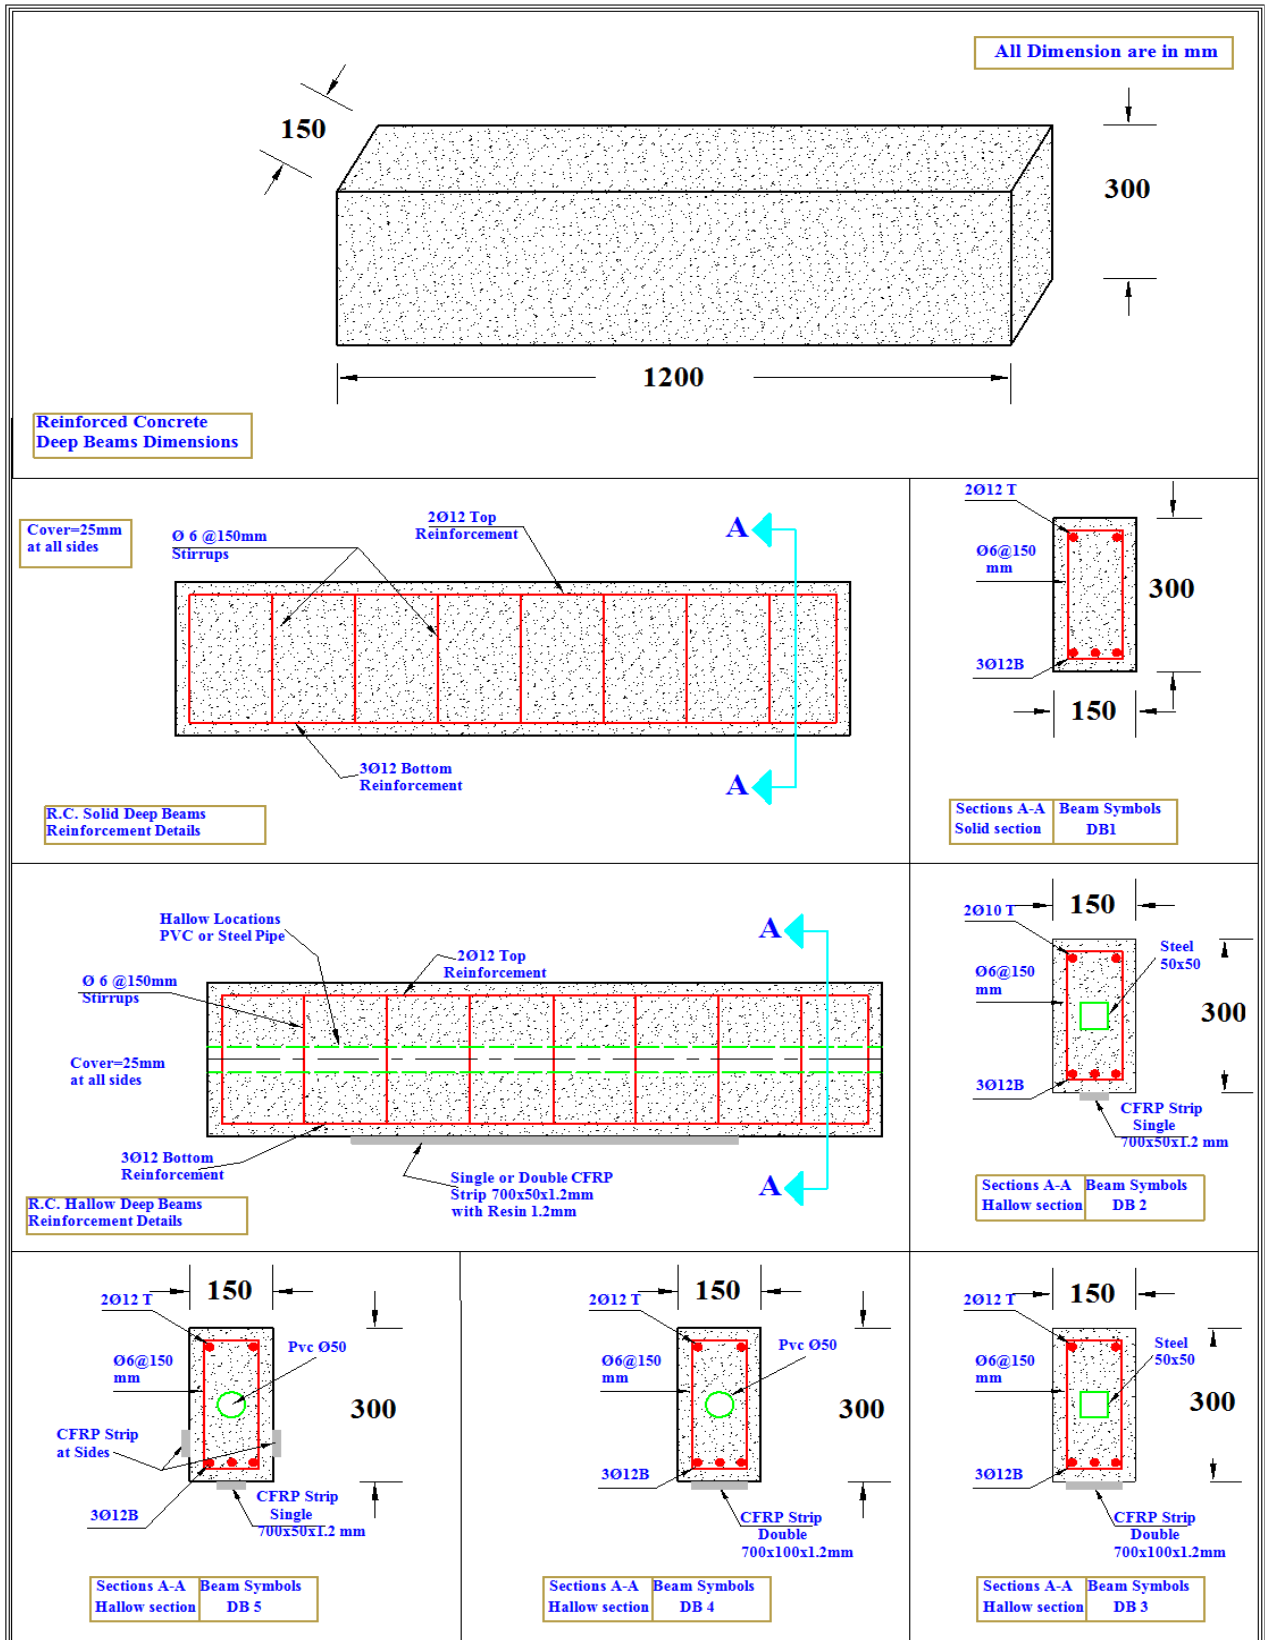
Details of Reinforced Concrete Deep Beams
